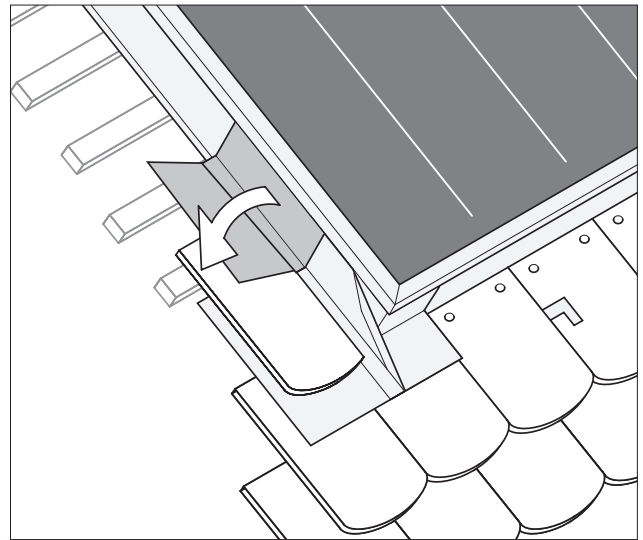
Insert side panels into deeper groove, adjust at upper edge of upper batten and mount overlapping from bottom up on each adjoining roof tile or slate row.
